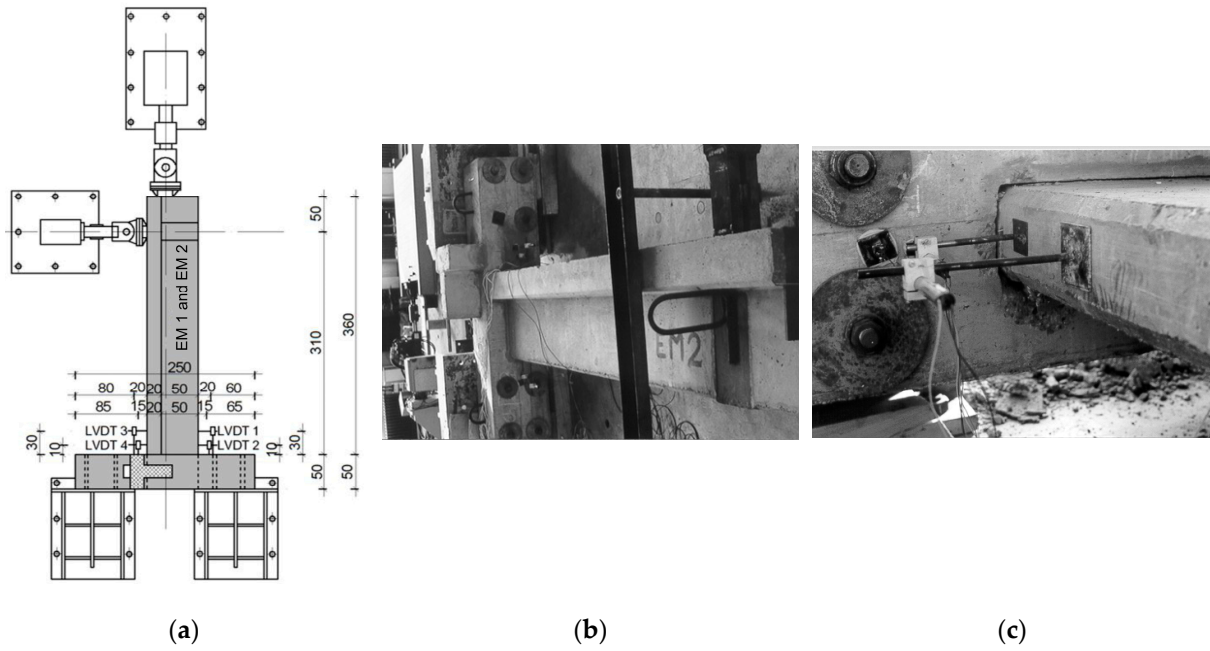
Connection corner column to floor beam: (a) cross-section of the models EM-1 and EM-2; (b) setup of the model EM-2; (c) failure of the model EM-2 [45].
